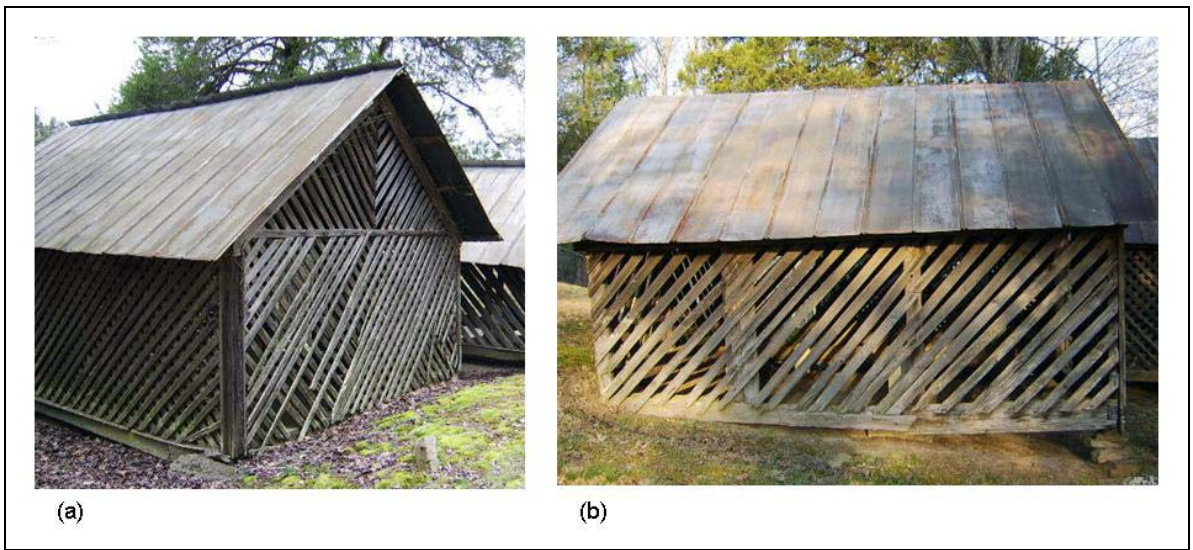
Damage to siding and foundation: (a) evidence of termite damage to the outer siding of GH-04; (b) Broken foundation of GH-05.
